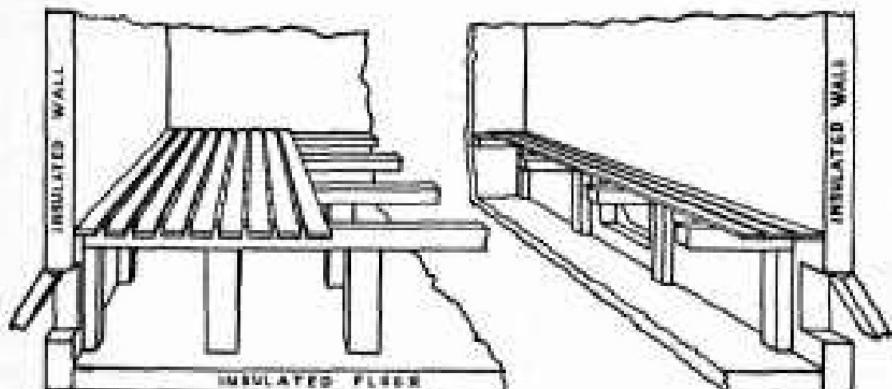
Sketch showing the arrangement of a false-floor structure for the common storage of apples, in order to allow the freest possible air circulation when the wall vents are open. The spaces between the floor boards should be about $1\frac{1}{4}$ inches wide. The dimensions and spacing of the materials of the structure should be determined by the strength required to support the maximum load that may be stacked.
